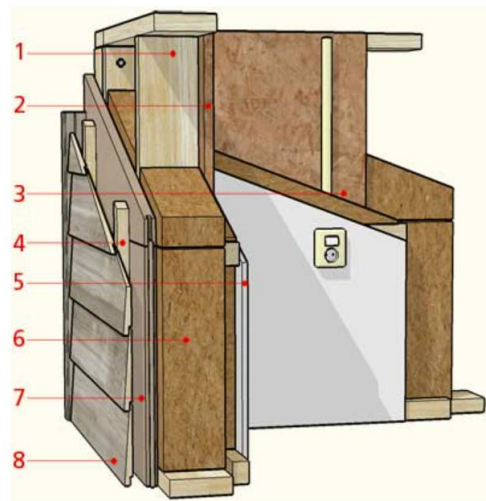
Details timber frame wall construction, source: scanabouw.nl
